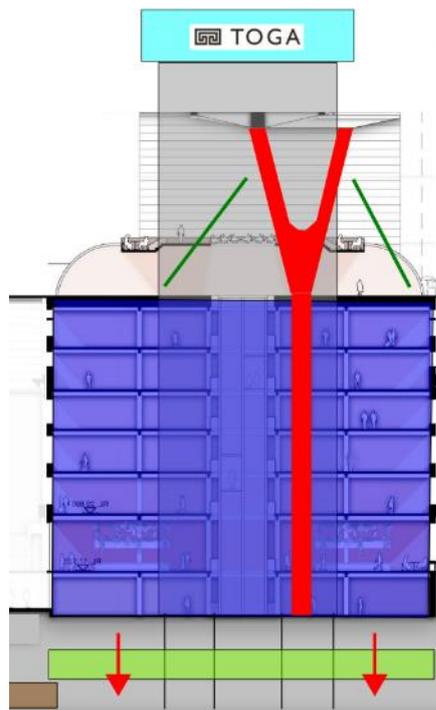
Elevation view of fPPb megacolumn installation
